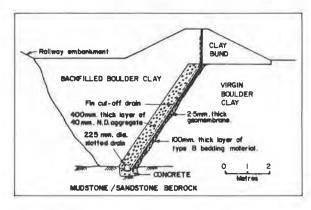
Detail of cut-off drains to toe of railway embankment.
